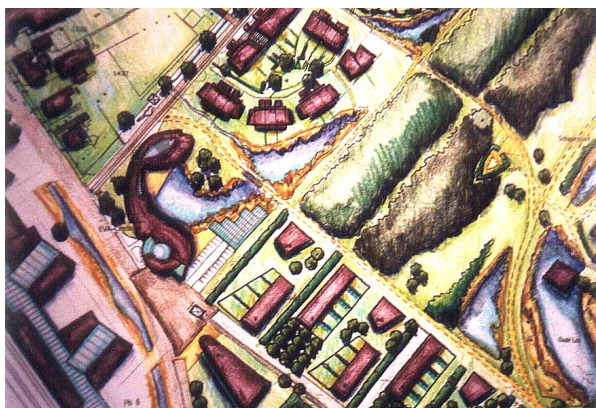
Detail Urban plan and EVA Centre J. Eble, Atelier 2T Architects.
